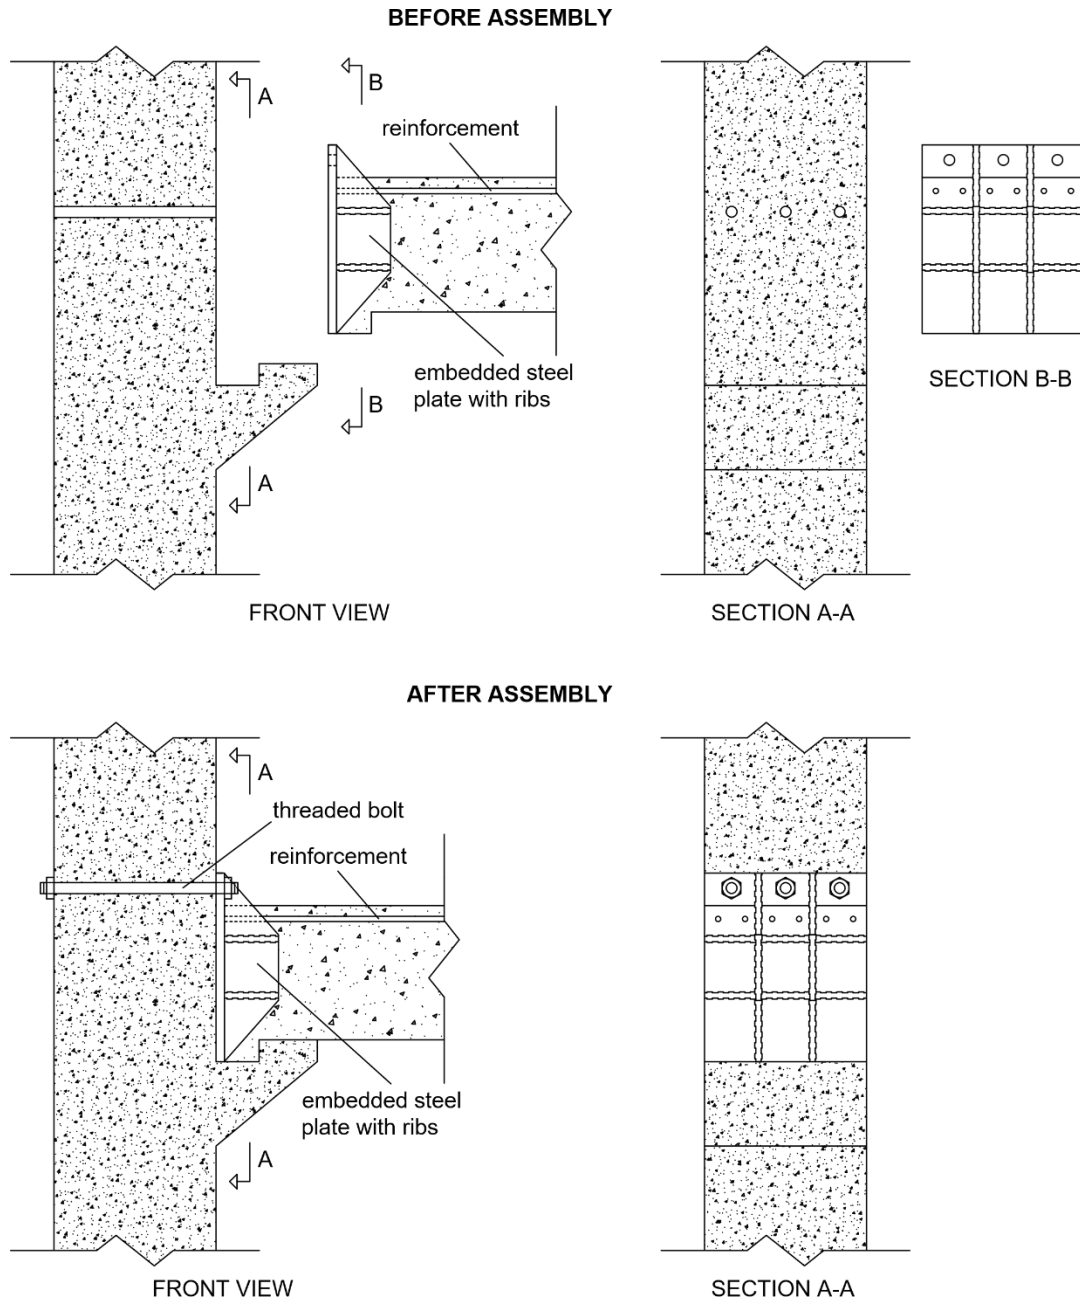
Schematic representation of a beam/column concrete dry connection – solution 1.
